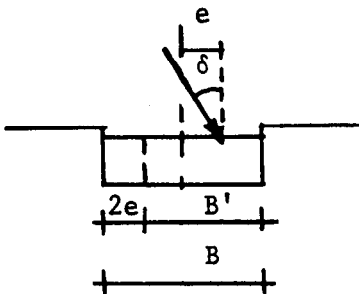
Shallow footing eccentrically loaded with a load inclined towards the edge.
